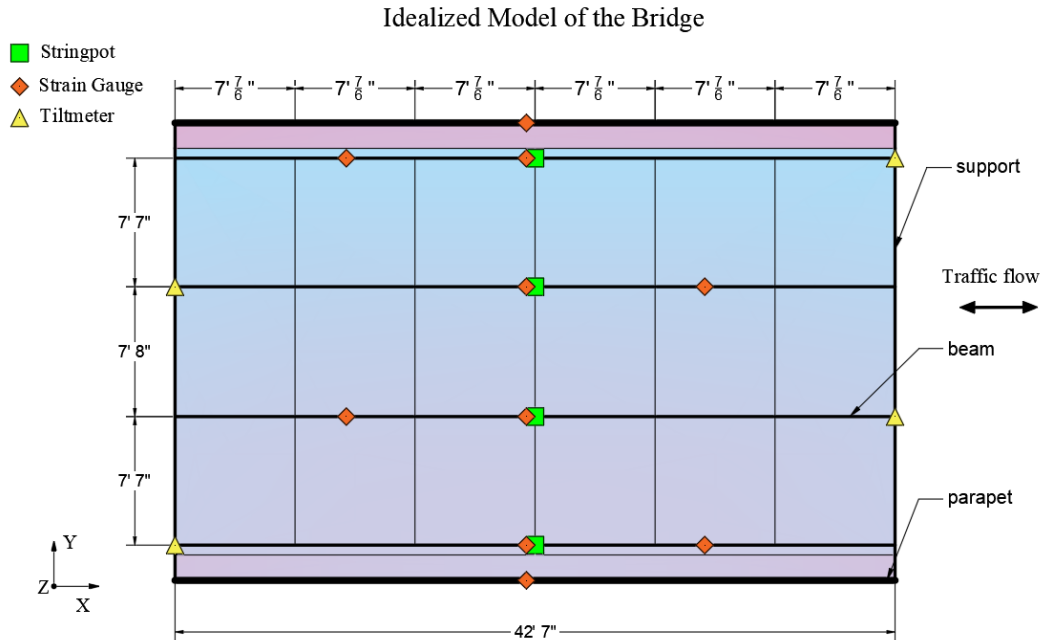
Instrumentation Configuration for Flat Creek Bridge for Live Load Testing
